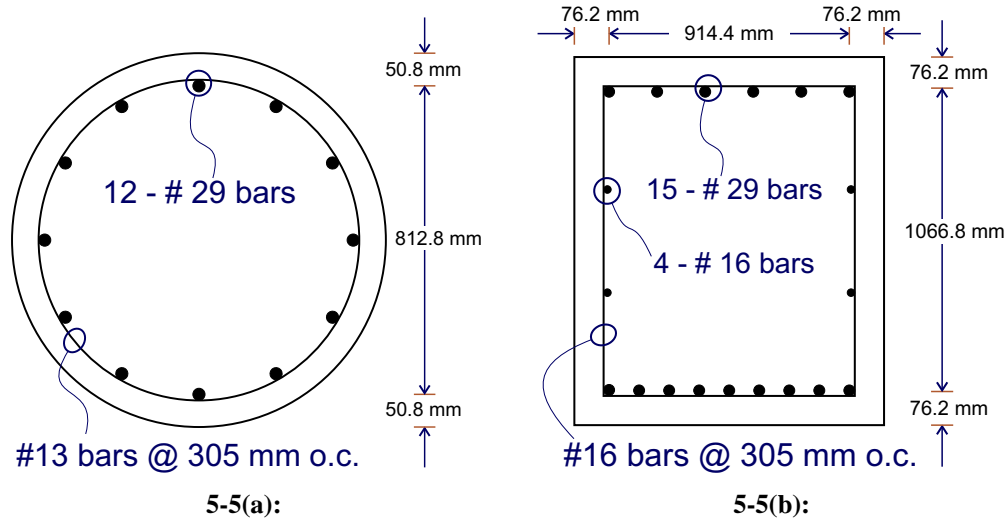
Concrete Member Reinforcing Layout (a) Bent Beam (b) Columns.
